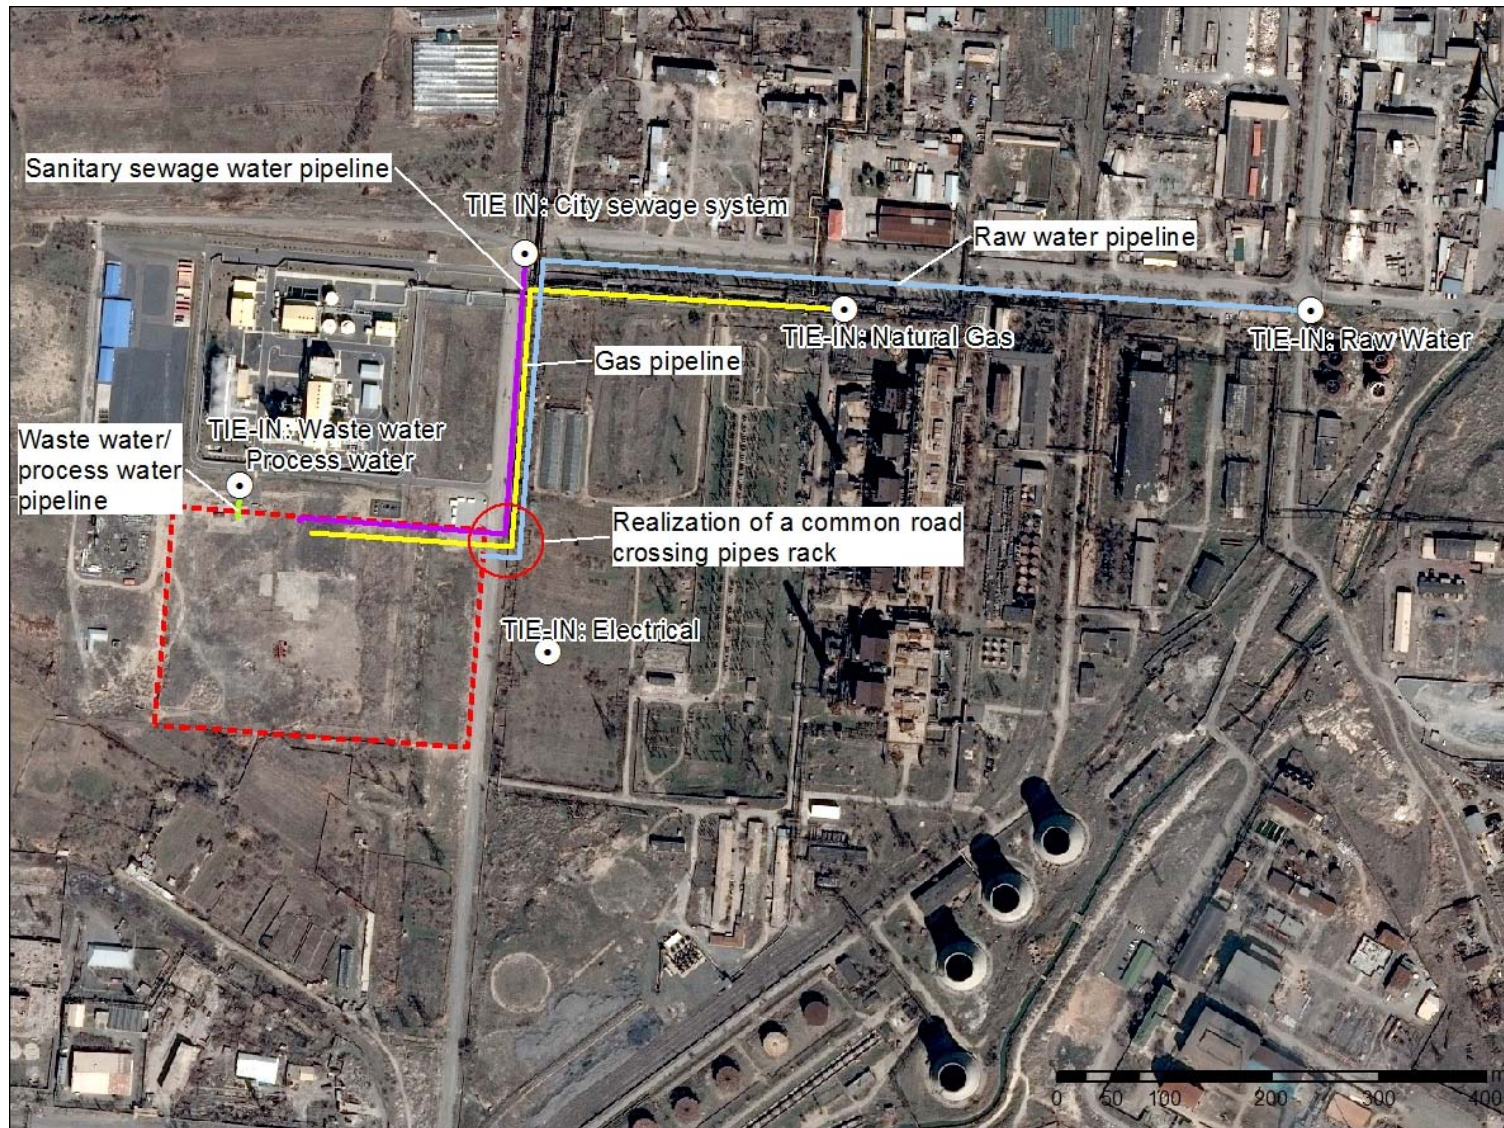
Overview plan showing the new interconnections of YCCPP-2
